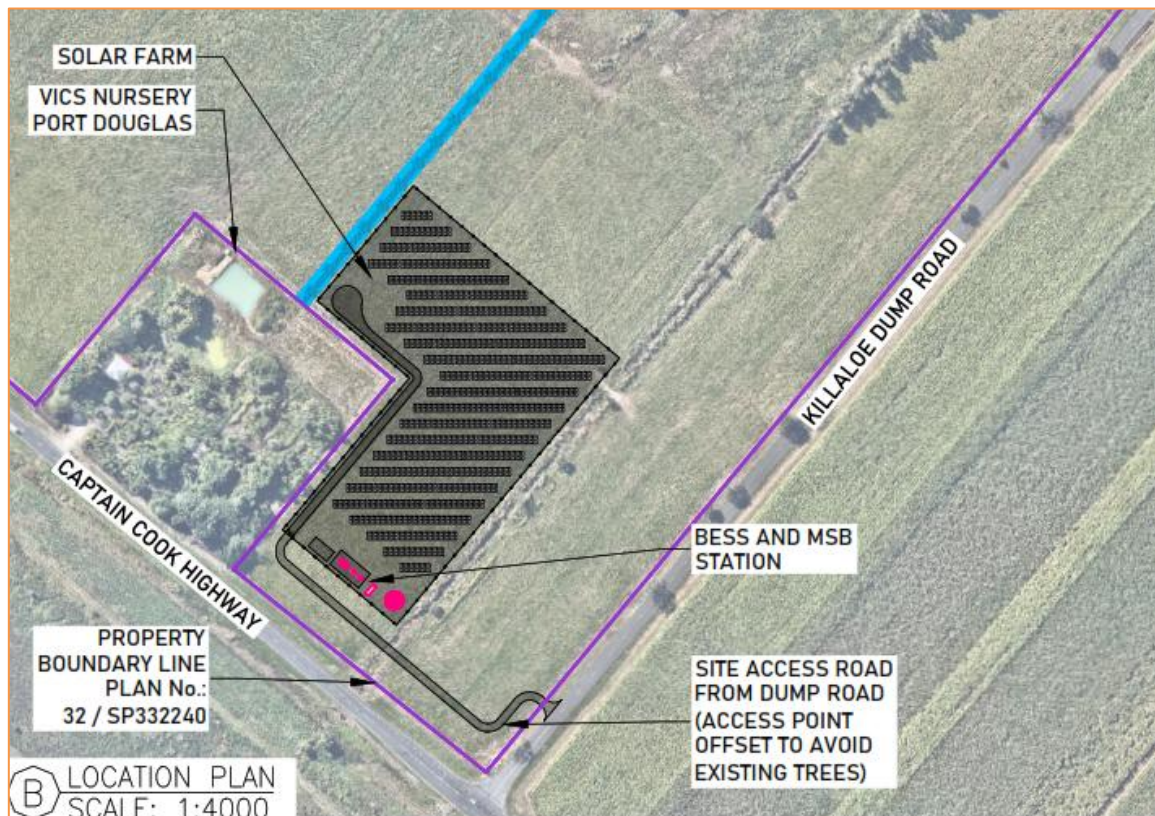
Extract of preliminary site plan (Source: EMM Energy)
